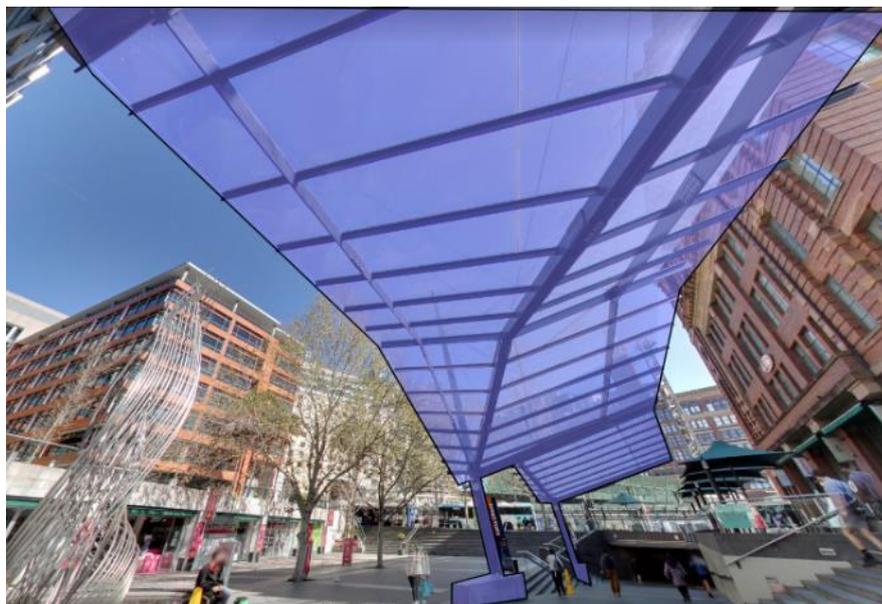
Elevation view of awning and south retail demolition works shown in purple.
